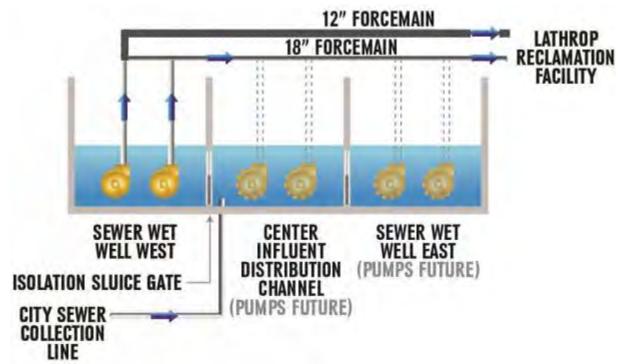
Collection Area Sewer Lift Station A1 Site Plan View
